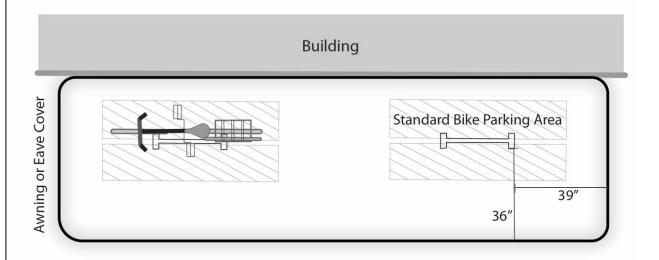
C.10.b. Covered Bike Parking Layout
